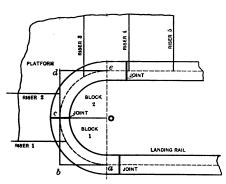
Plan of Cylinder and Steps Adjoining.
